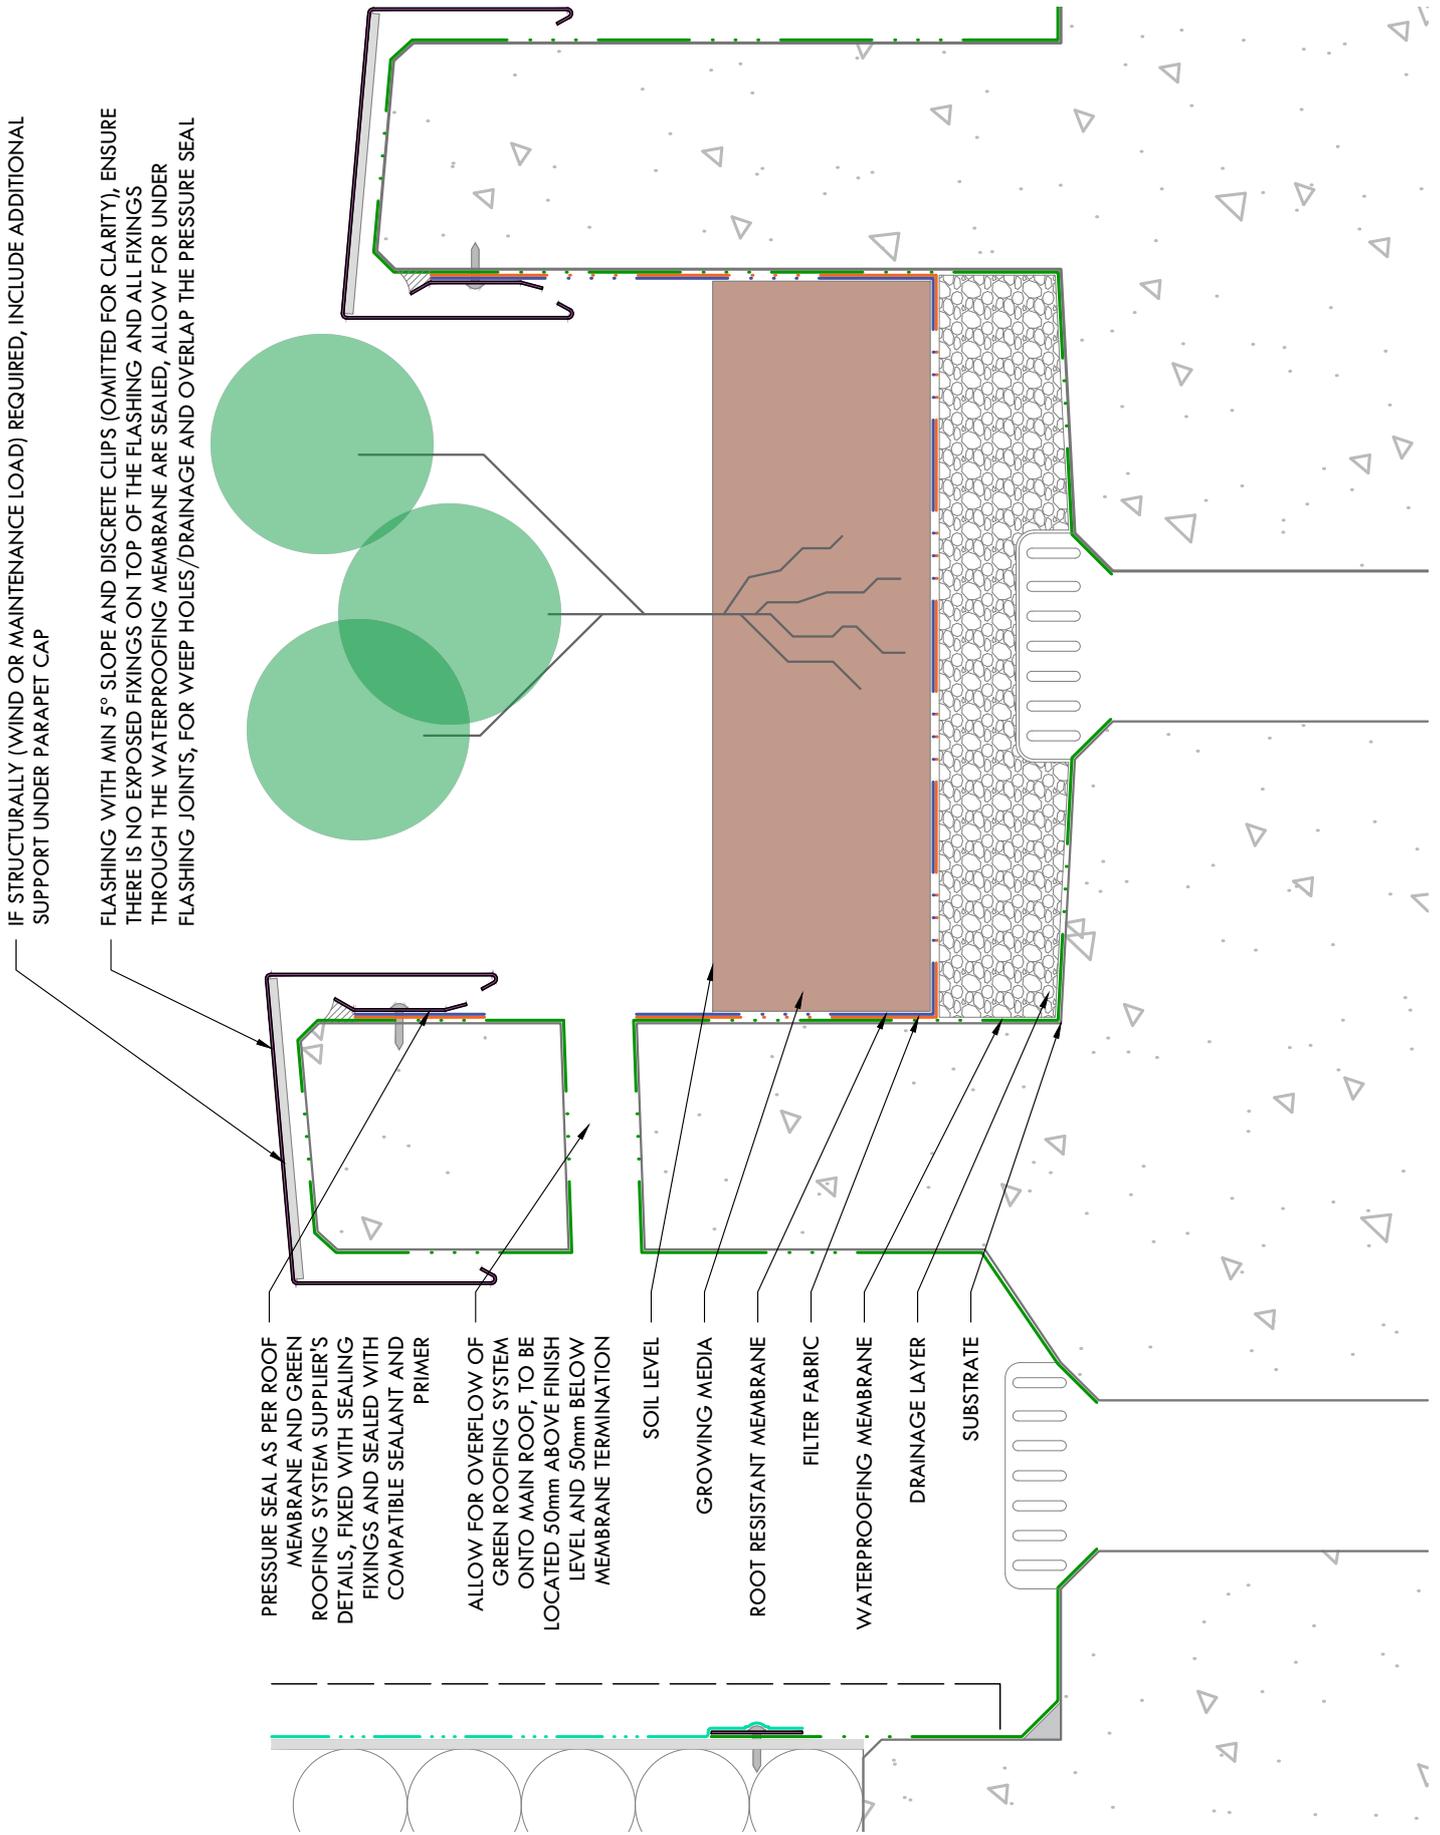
GREEN ROOFING SYSTEM BUILD-UP
